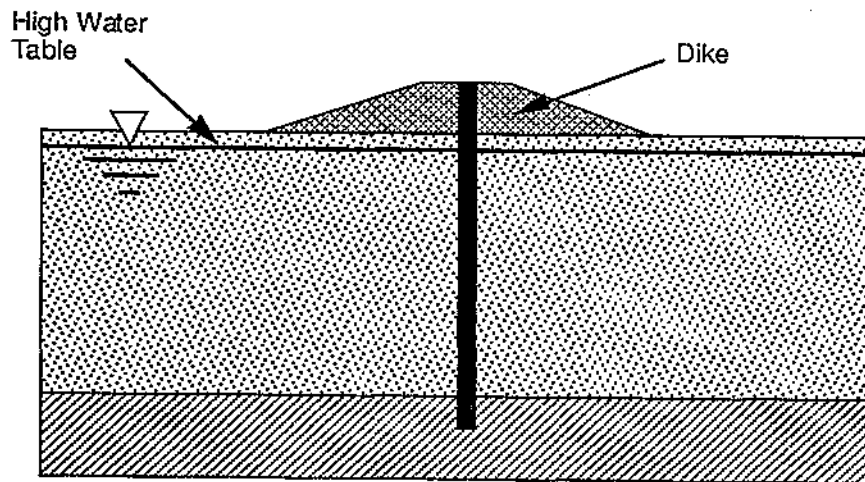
Construction of Dike to Raise Ground Surface for Construction of Slurry Trench.
